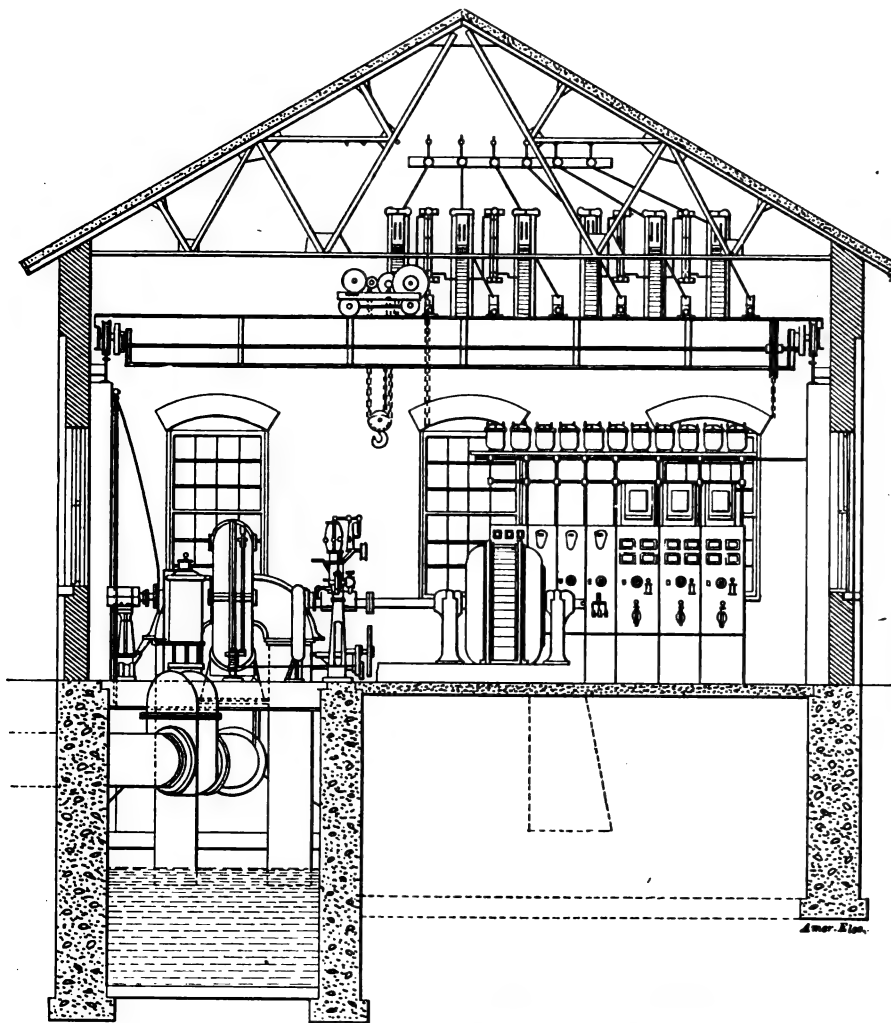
SECTIONAL ELEVATION OF MAIN STATION.
